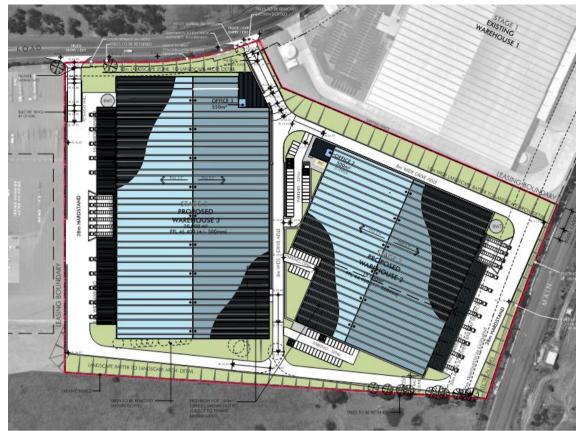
Site plan of of the proposed development, referred to as Stage 2 and warehouse 2 and warehouse 3.
